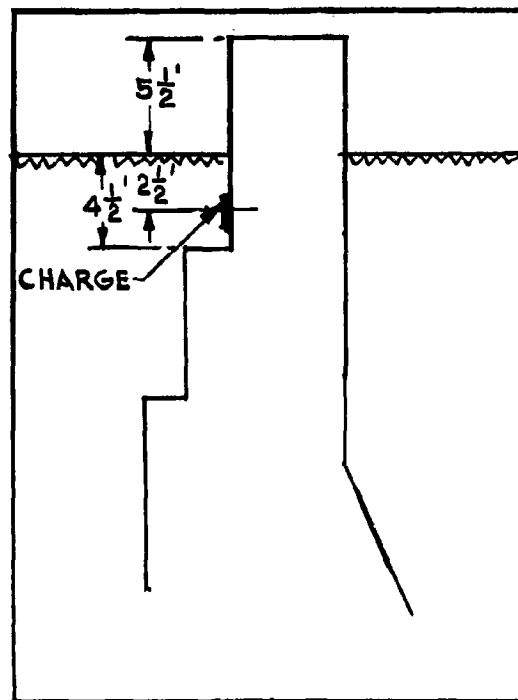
Forty-five-pound charge placed $2\frac{1}{2}$ feet below surface on shore side of wall effectively breached wall.
